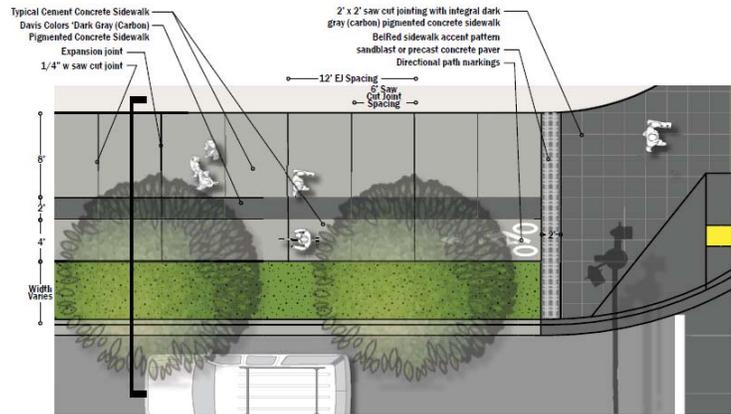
Typical Multi-purpose Path or 14' Wide Sidewalk
